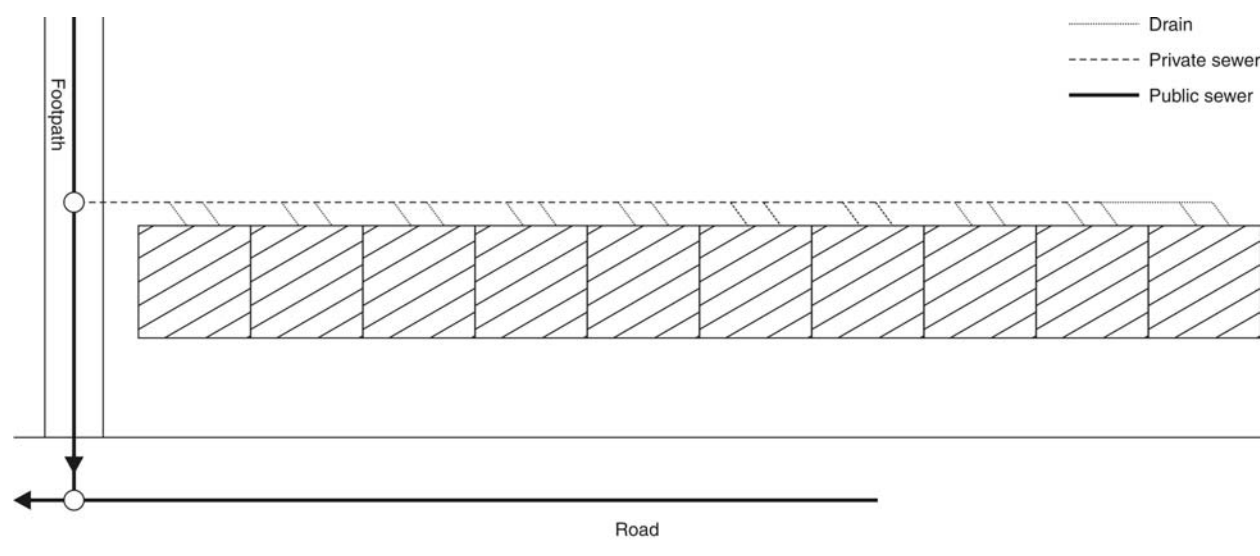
1970s/1980s town house/terraced property foul drainage layout
